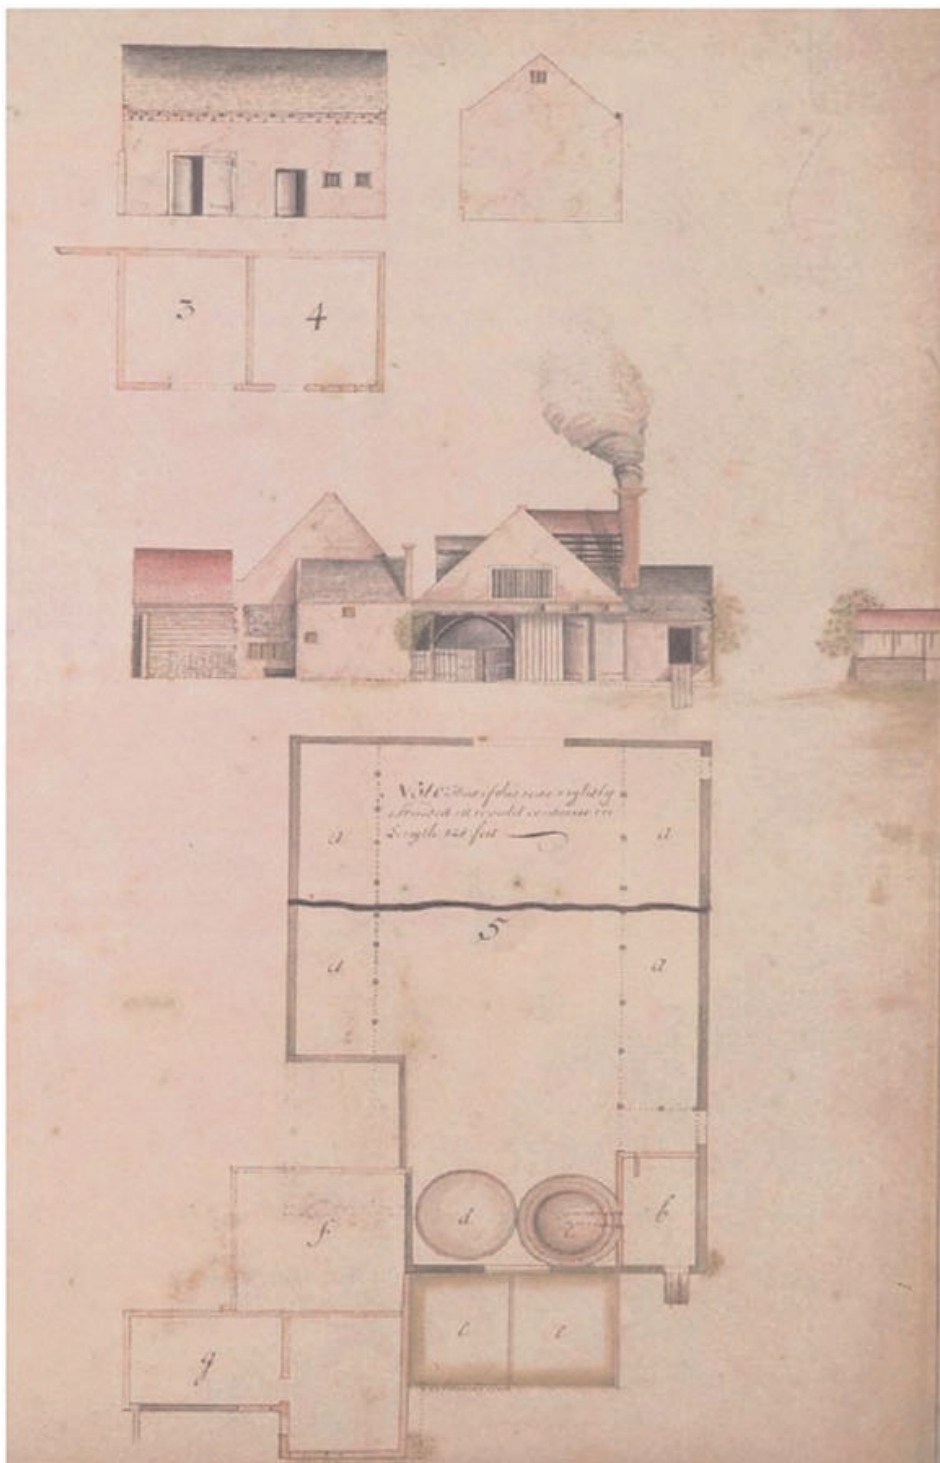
1716 plan and elevation by Gough of the Weevil Brewhouse. (Colour online)
